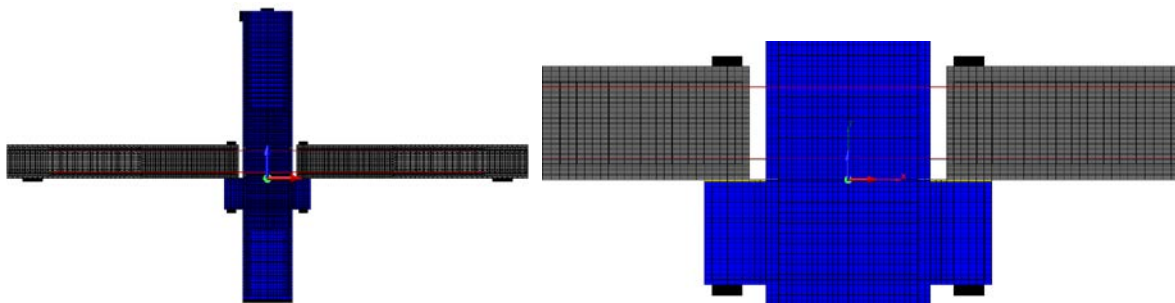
c) - Model A without connection mortar stratum; d) zoom of beam-column joint region.
